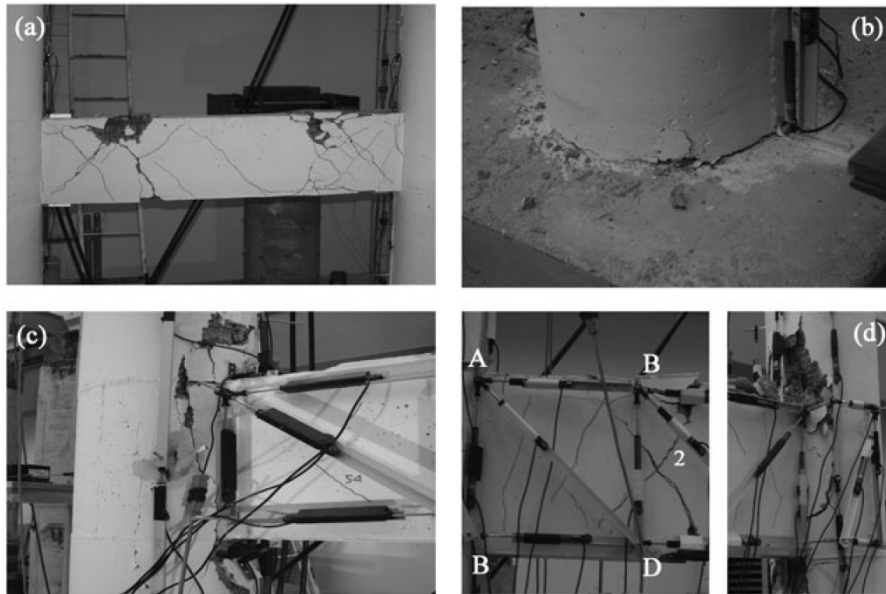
(a) Shear cracking pattern of the transverse beam of specimen #1; (b) crack at the base of a column of specimen#1; (c) failure of both the joints of specimen #2; and (d) failure mode of specimen #3: shear failure of the transverse beam and joint
